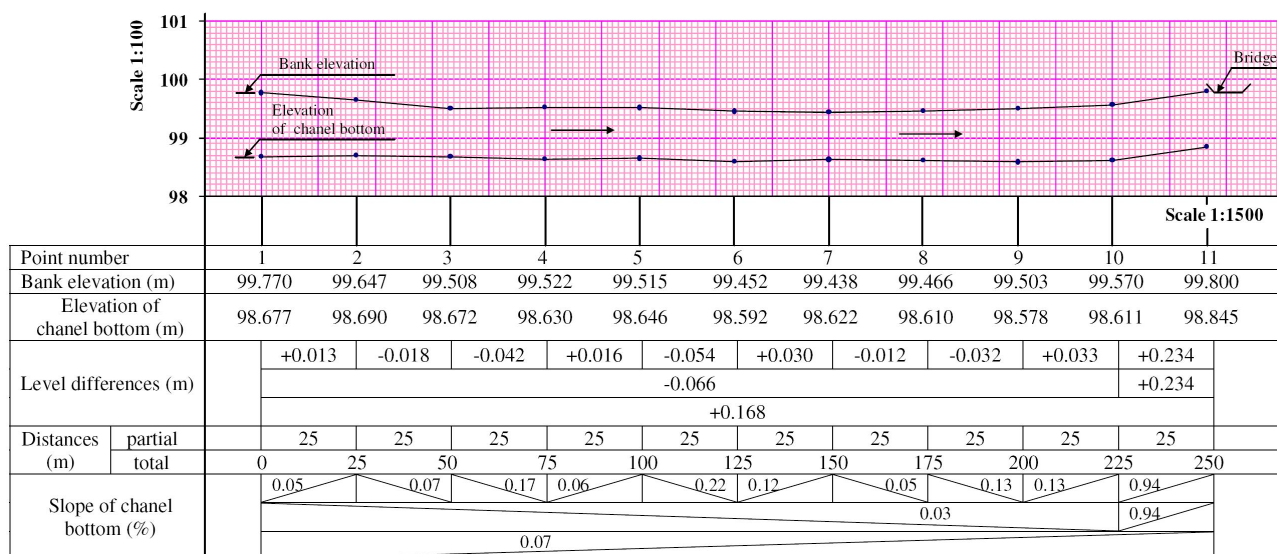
Longitudinal section on the CC₁ canal, upstream of the culvert
